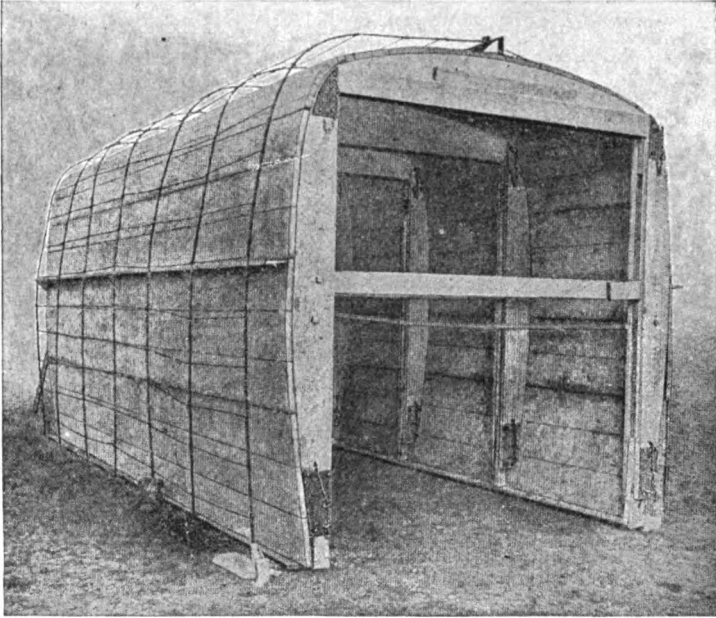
General View of the Arrangement of Wooden Framing and Reinforcing Bars used in the Concrete Lining of Underground Roads in Béthune Colliery.
